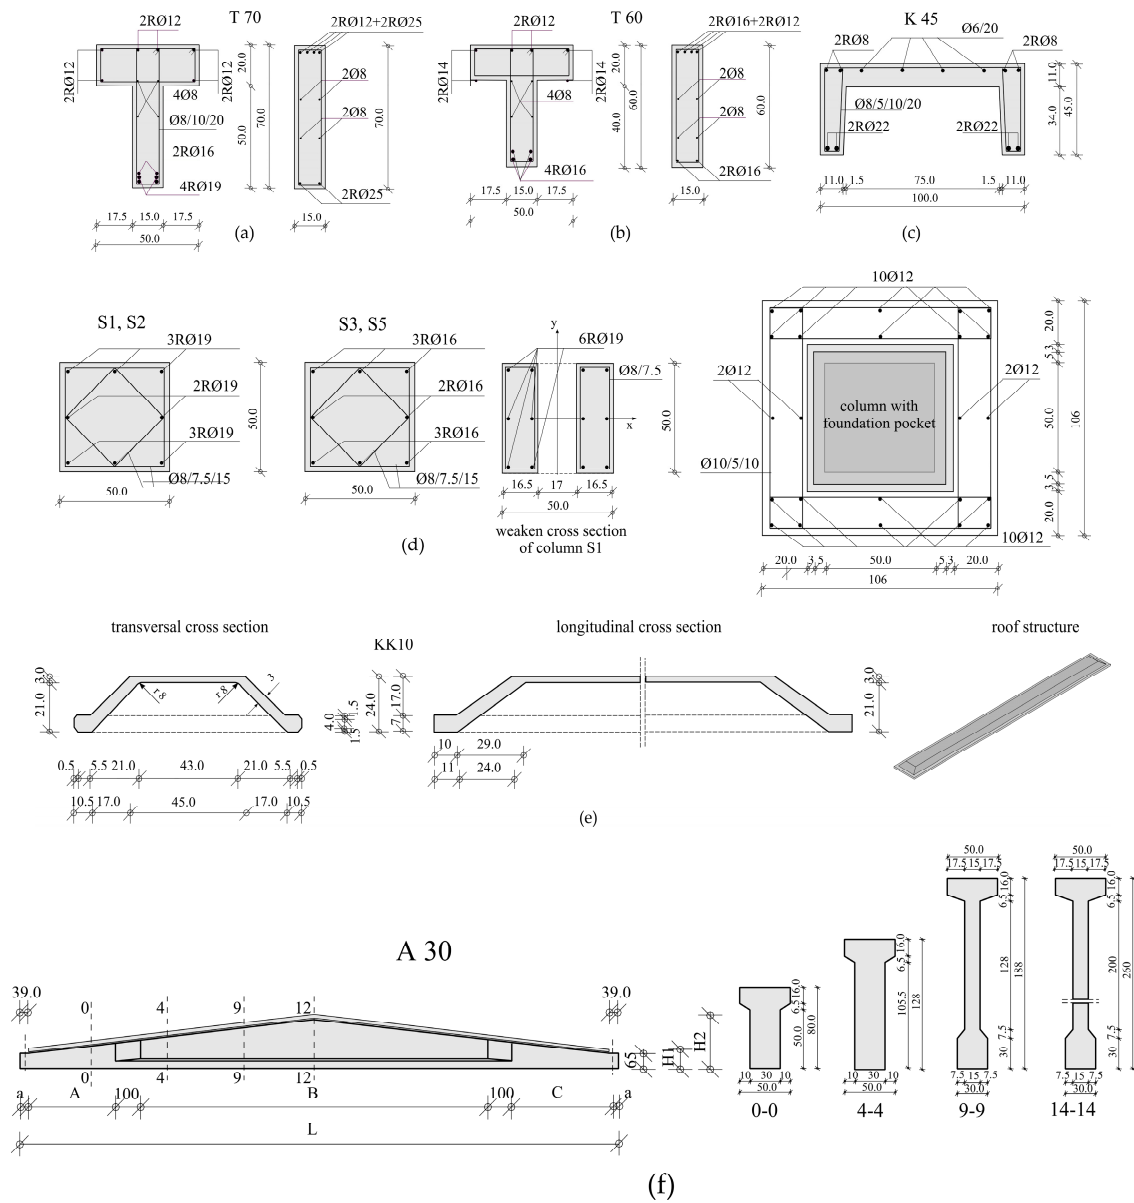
The elements of the considered precast industrial hall: (a,b) floor beams, (c) element of floor structure K 45, (d) columns and column with foundation pocket, (e) element of roof structure, (f) roof beam (main girder).
